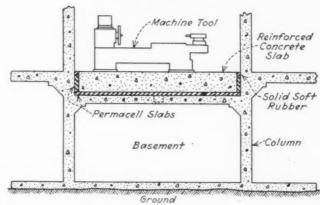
USE OF STRUCTURAL SPONGE RUBBER IN BUILDING CONSTRUCTION TO ABSORB SHOCK AND VIBRATION
